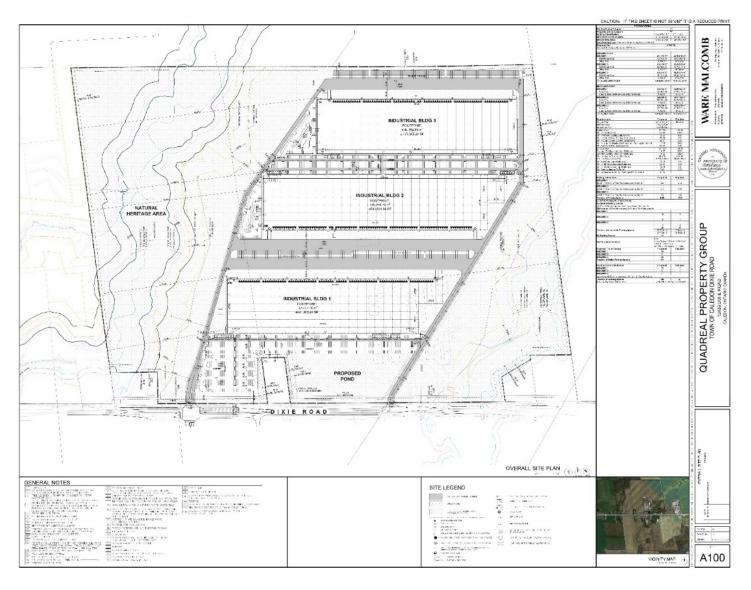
Proposed Site Plan of 12489 Dixie Road, Caledon, Ontario
